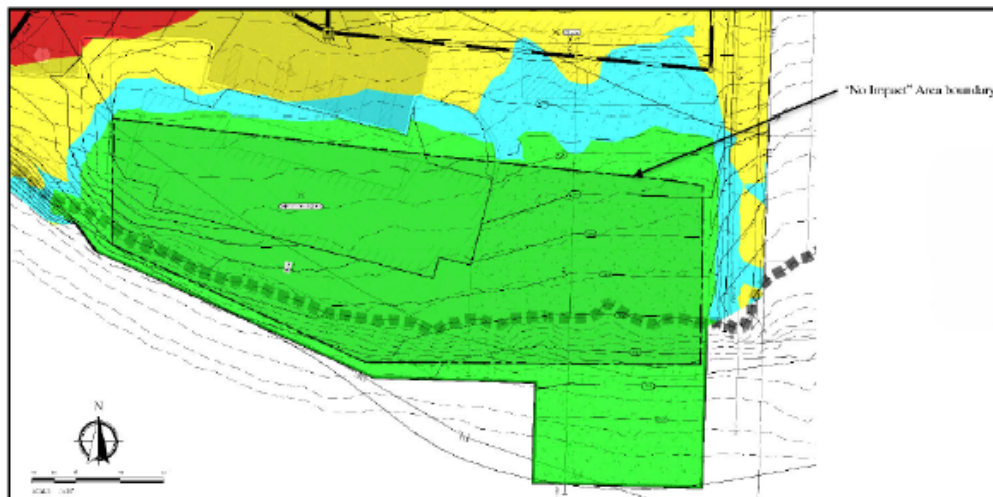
Plan view depicting the area being avoided by placing fill on the existing surface.
